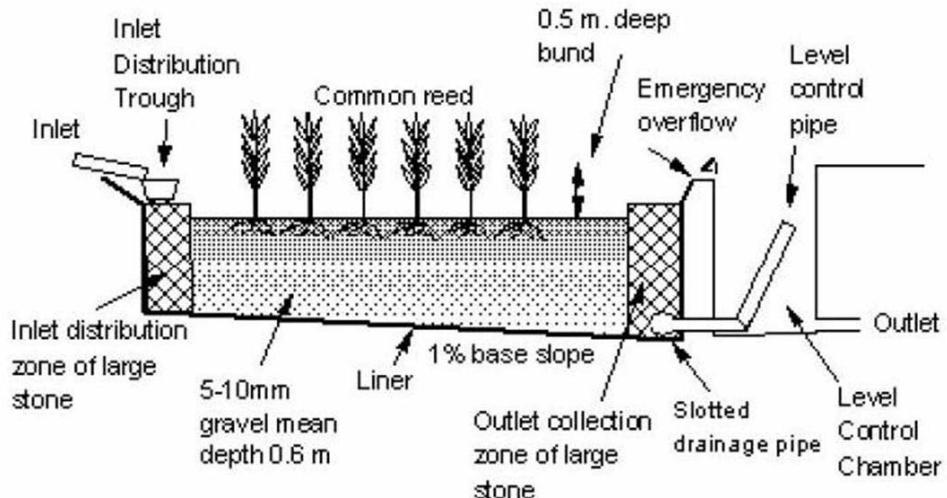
Longitudinal section of a subsurface horizontal-flow constructed wetland.
